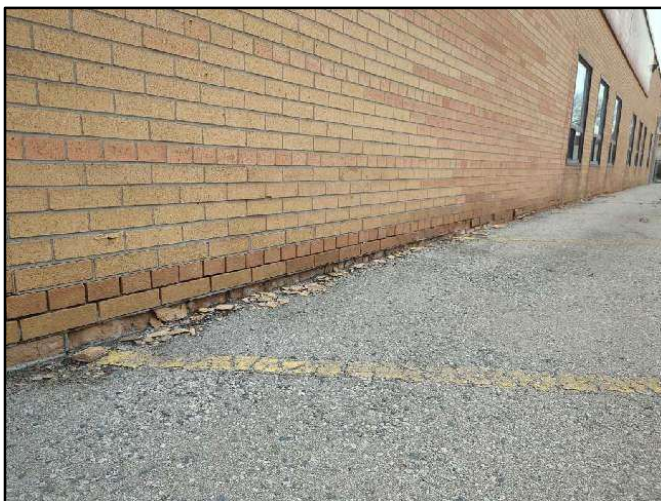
Brickwork at grade that requires repair at the northwest corner of the building.
